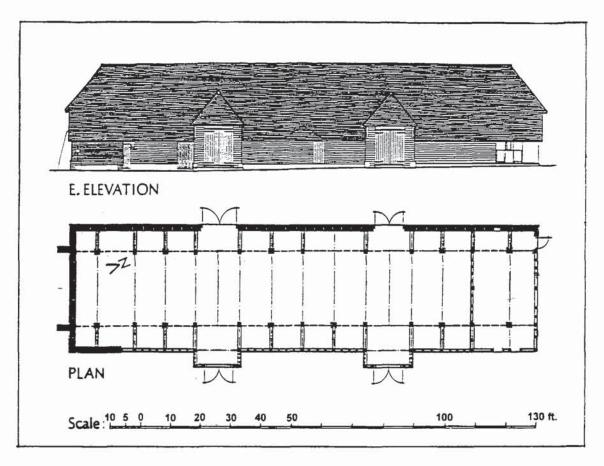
East elevation and plan of the Abbey barn, Titchfield (drawing by John Reynolds)
